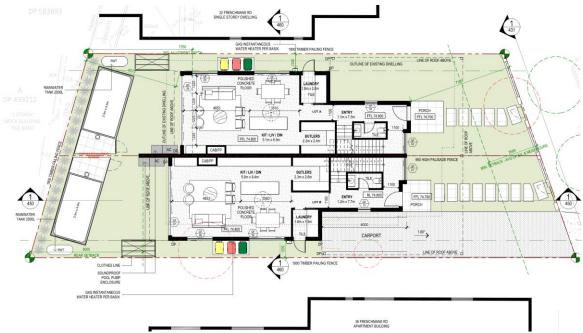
Proposed Ground Floor Plan - 34 Frenchmans Road
